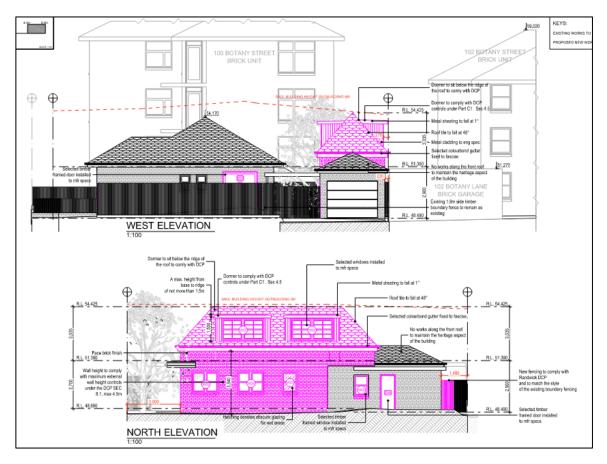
Proposed North and West elevation plans (Source: Gardner Design & Drafting).
